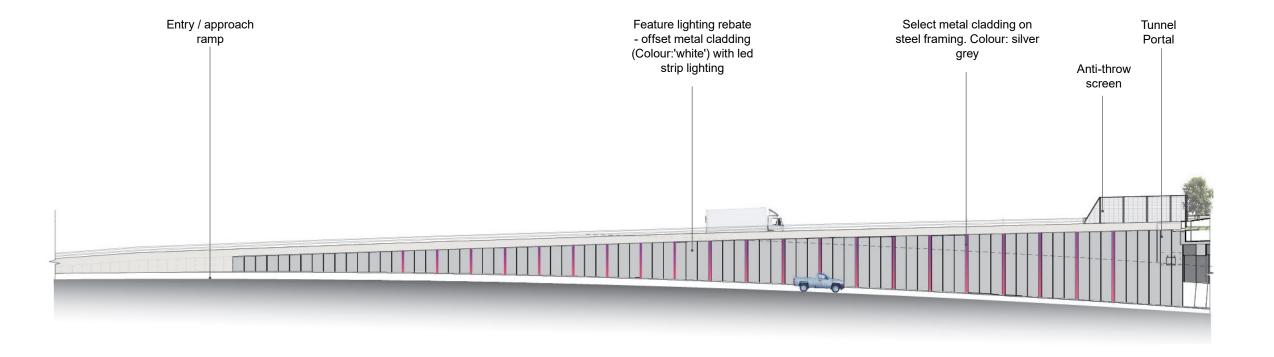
Iron Cove Link - Tunnel portal dive wall - north elevation
